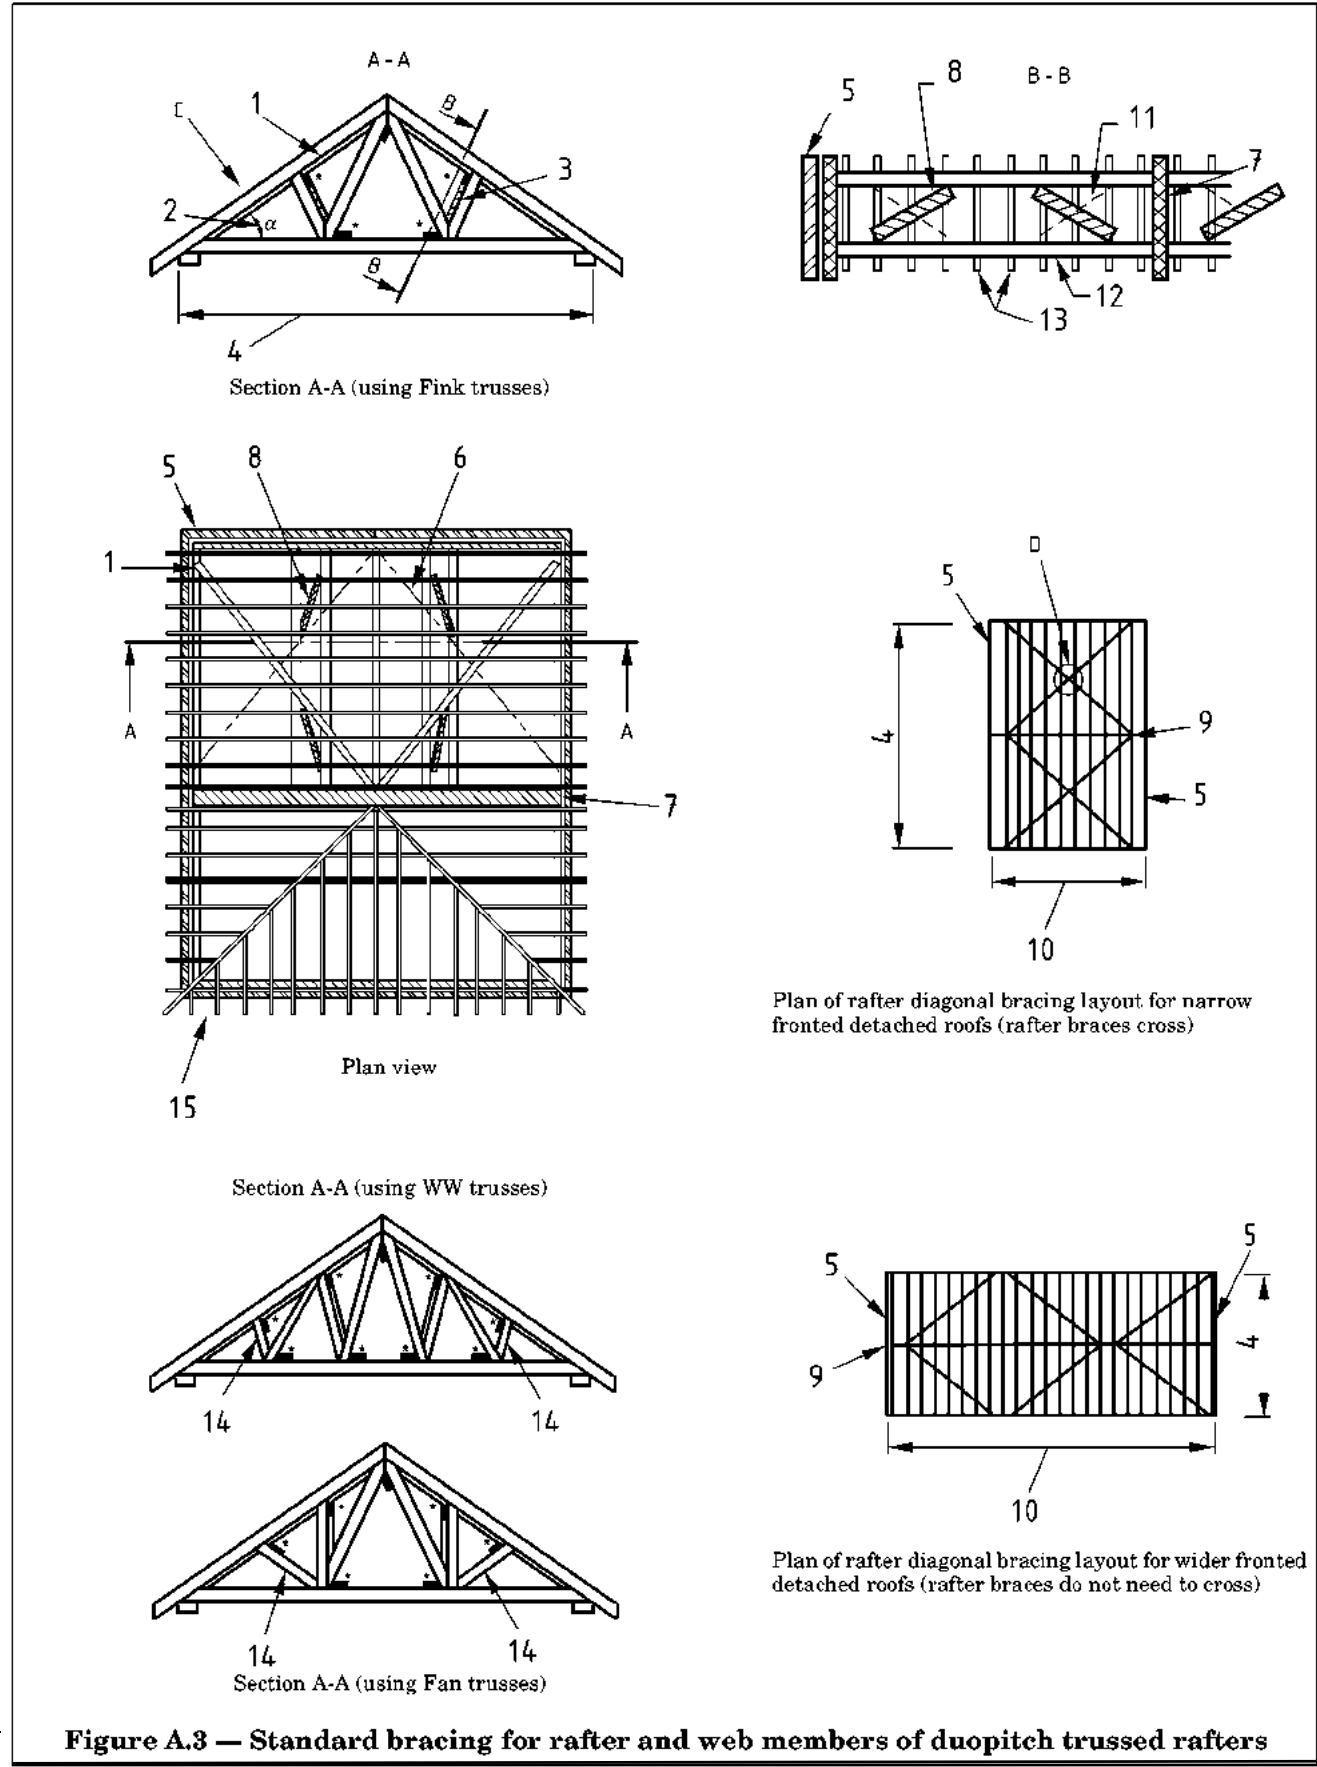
Standard bracing for rafter and web members of duopitch trussed rafters
